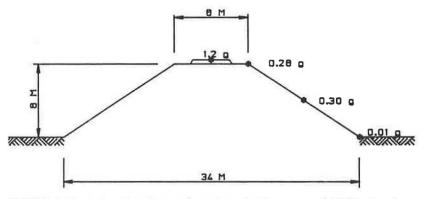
Vertical accelerations at the surface of an instrumented SNCF railroad embankment.
